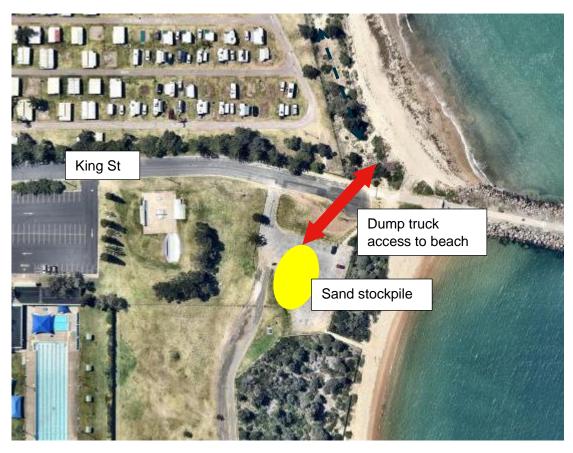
King St Site Plan (December 2019 Pilot Exercise)
